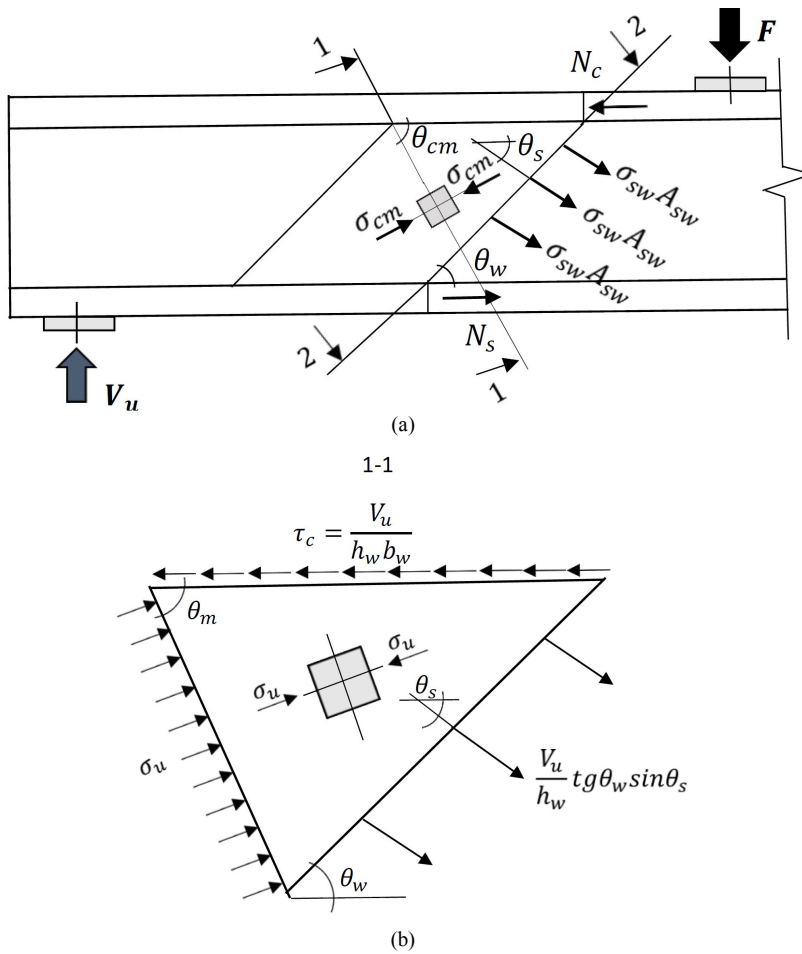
Design model of an I-beam element failure due to concrete fragmentation in the zone between inclined cracks:
